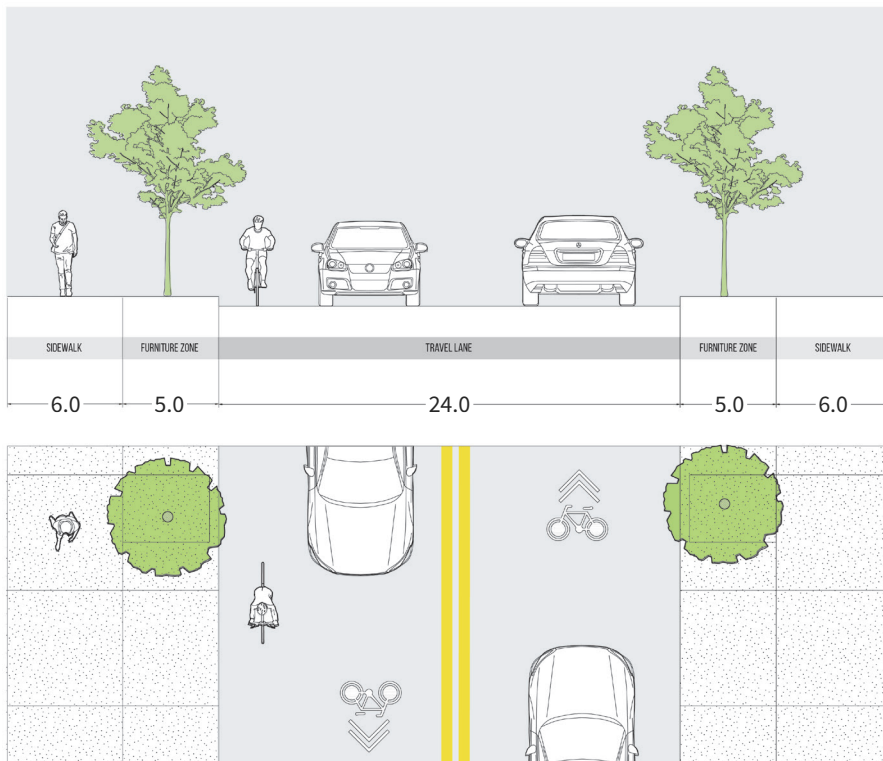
6. Typical bicycle boulevard section, showing shared lane markings in the travel lane, sidewalk, and furniture zone. Courtesy of BREC.
